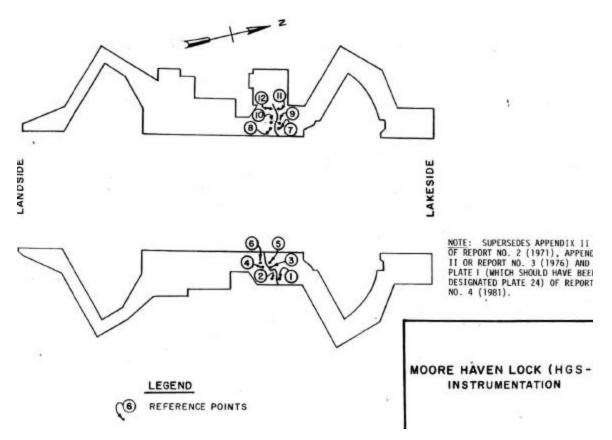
Typical monitoring point scheme across existing cracks on a concrete structure--HGS-1, Central and Southern Florida Flood Control Project (Jacksonville District)
